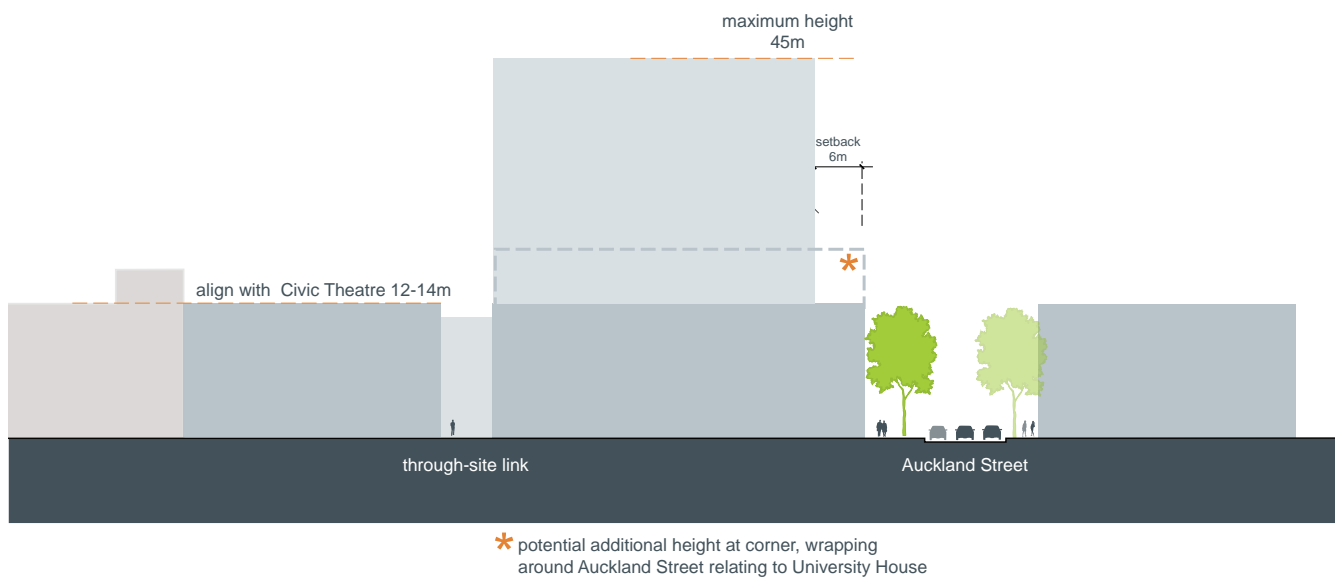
Section through the University of Newcastle site showing building form and setbacks
